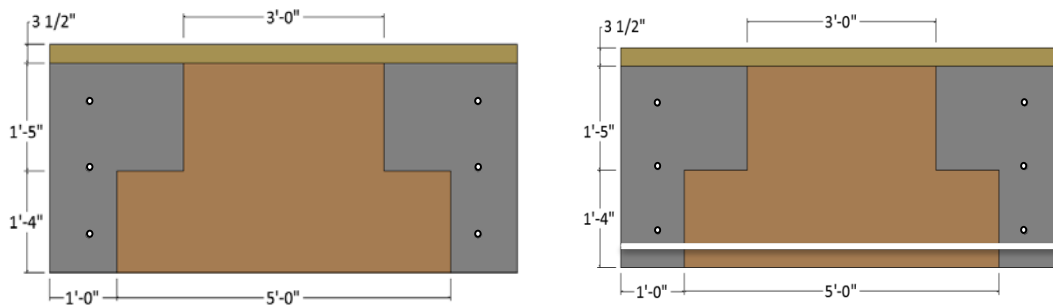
Simplified system test details: as-built (left); grouted strand (right)
